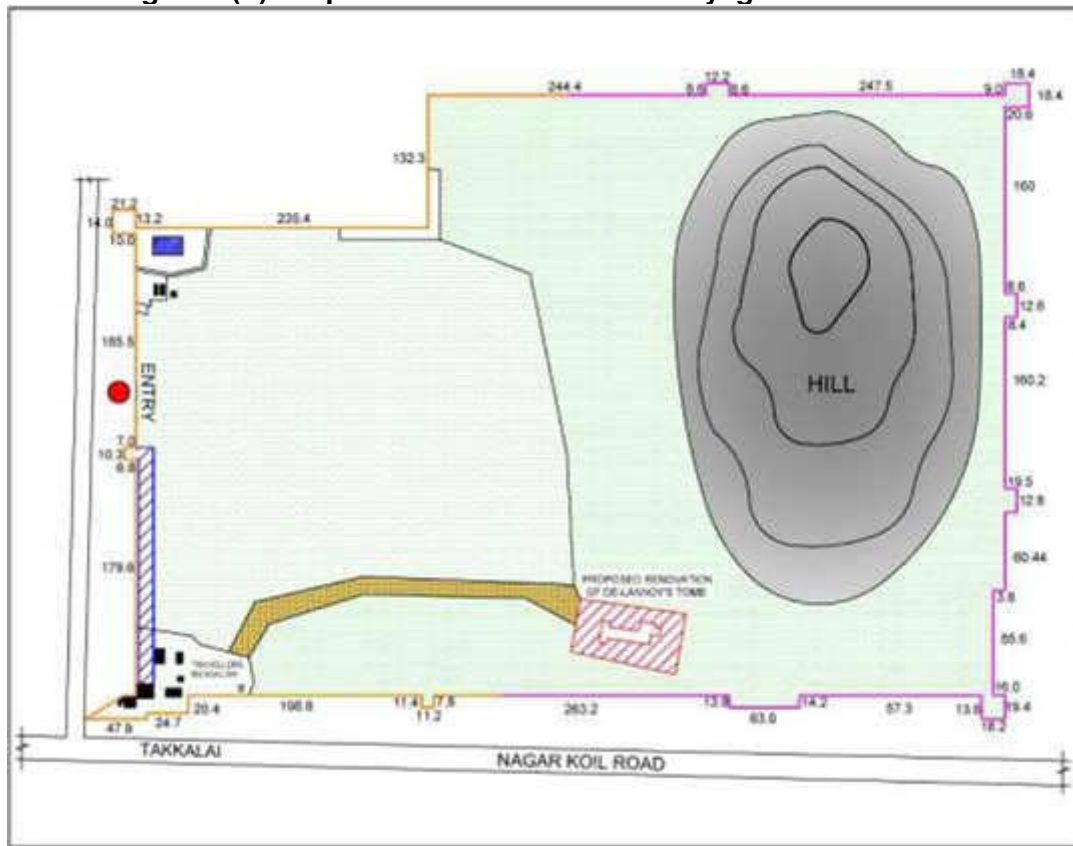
(b) Proposed site plan for subproject components – Udhayagiri fort
